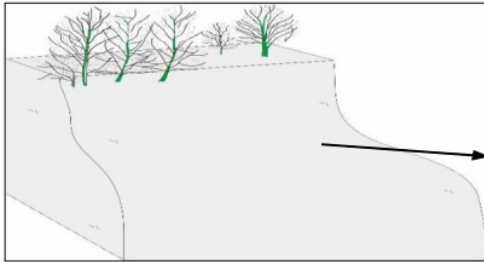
Sketch illustration Shotcrete with a Thickness of 3.3 inches On Slope Section 1
